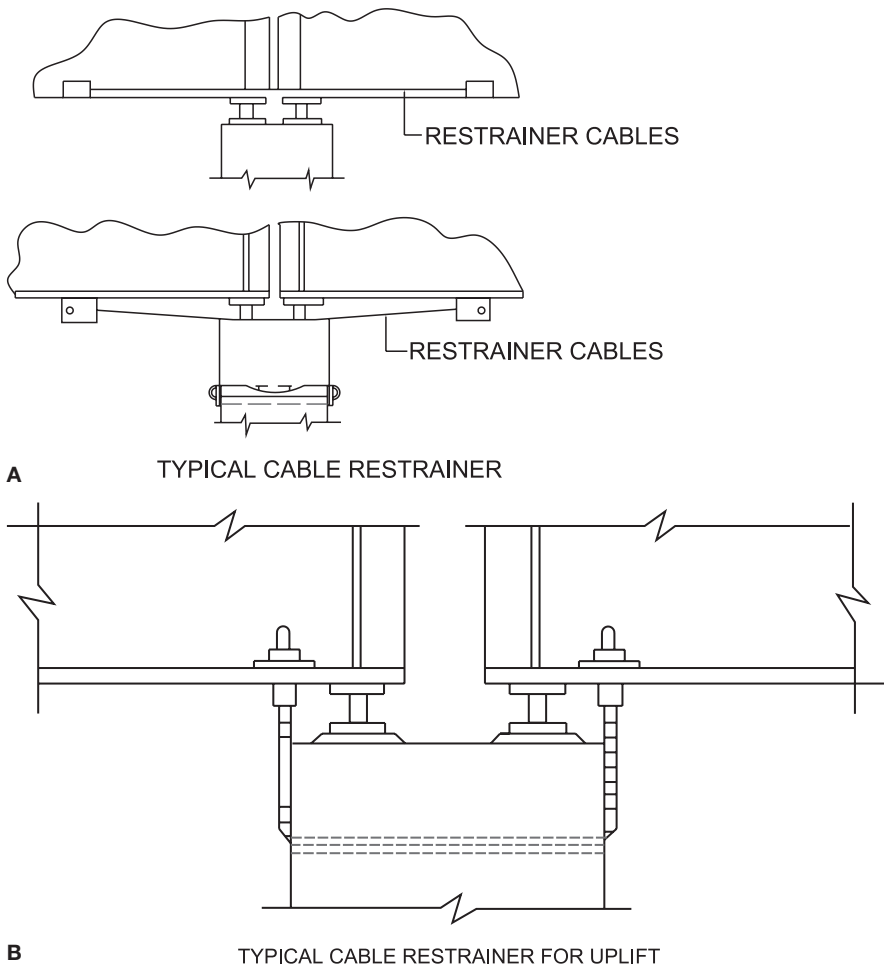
(A) Steel girders retrofit. (B) Alternate use of cable restrainers for steel girders.
